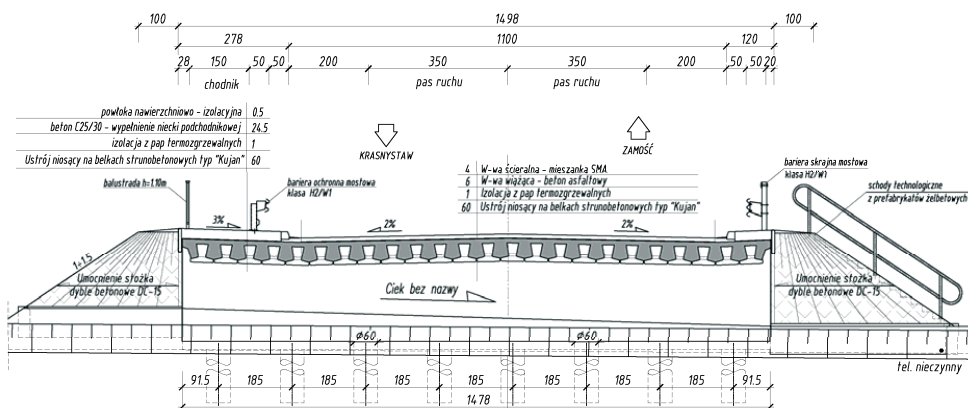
The cross-section of the existing bridge and footbridge in Stary Zamość [12].
